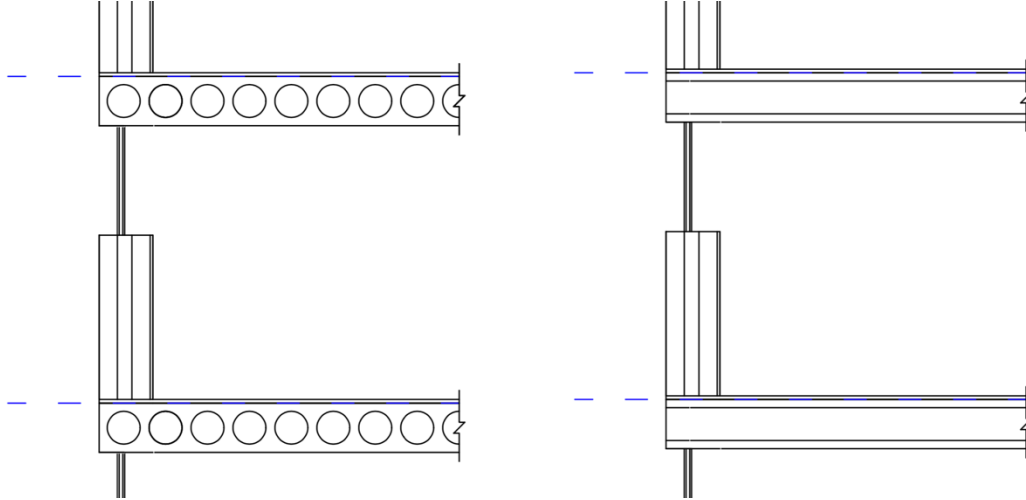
North-South (left) and East-West (right) Building Sections
